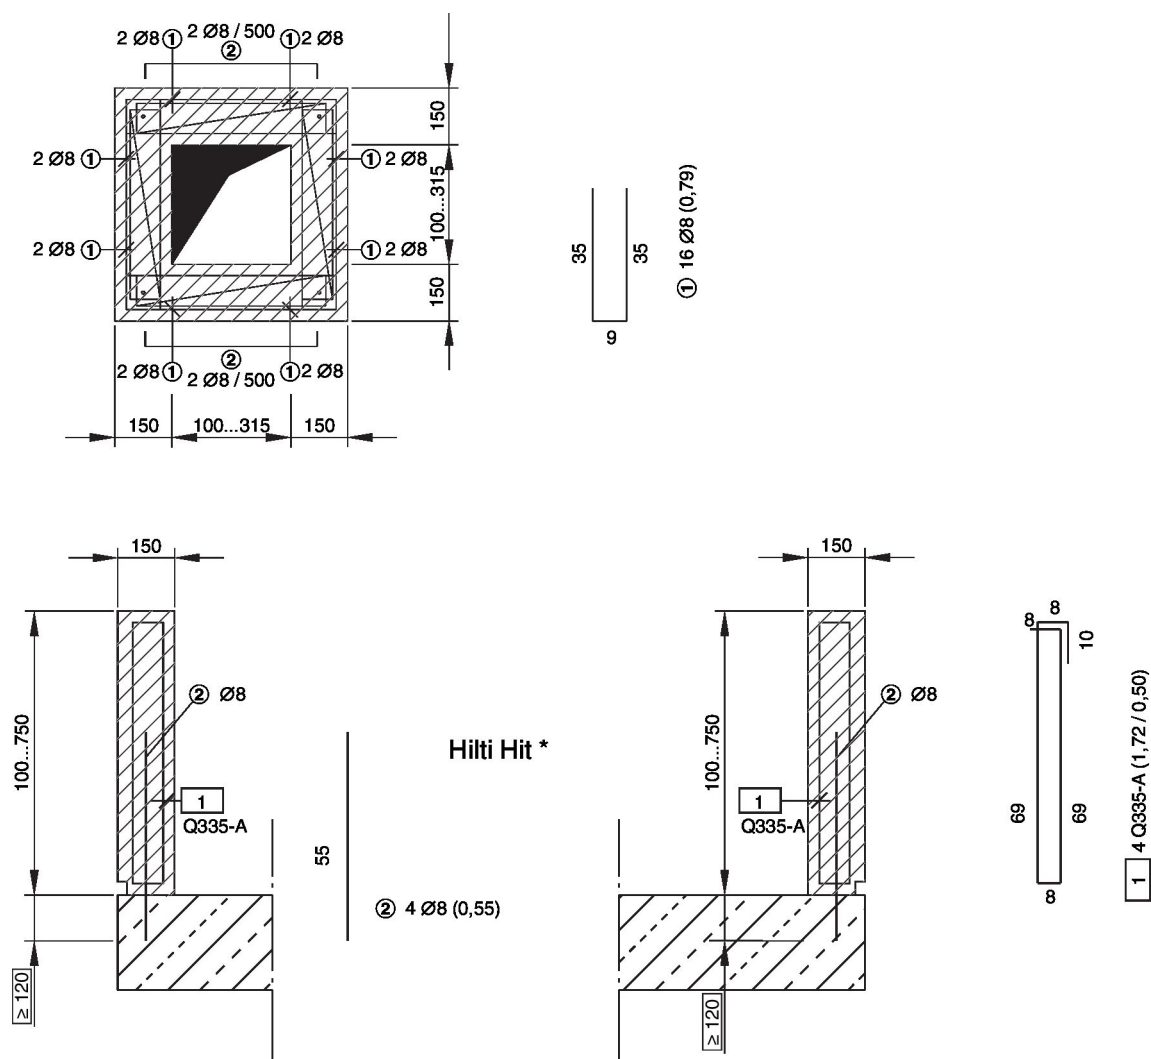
Reinforcement plan for concrete bases with a height of 100 to 750 mm
